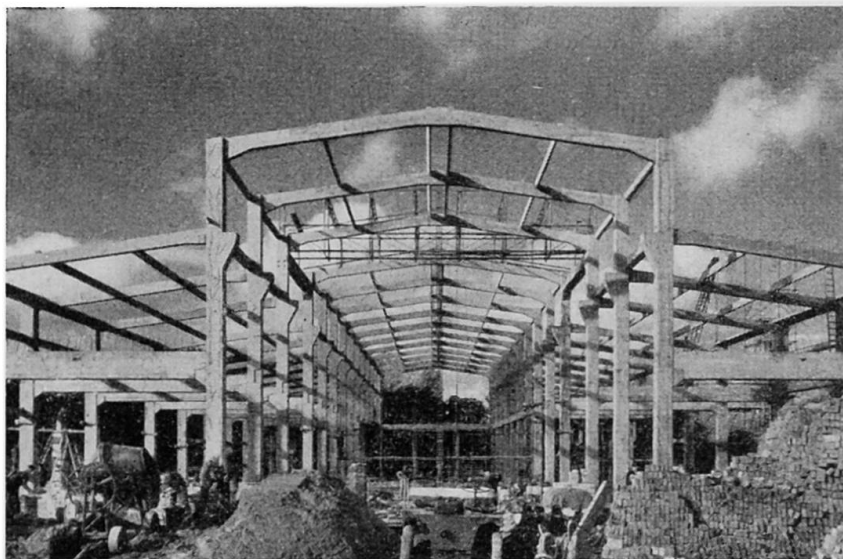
Reinforced concrete framework in factory for Access Equipment Co. Ltd at Hemel Hempstead.
